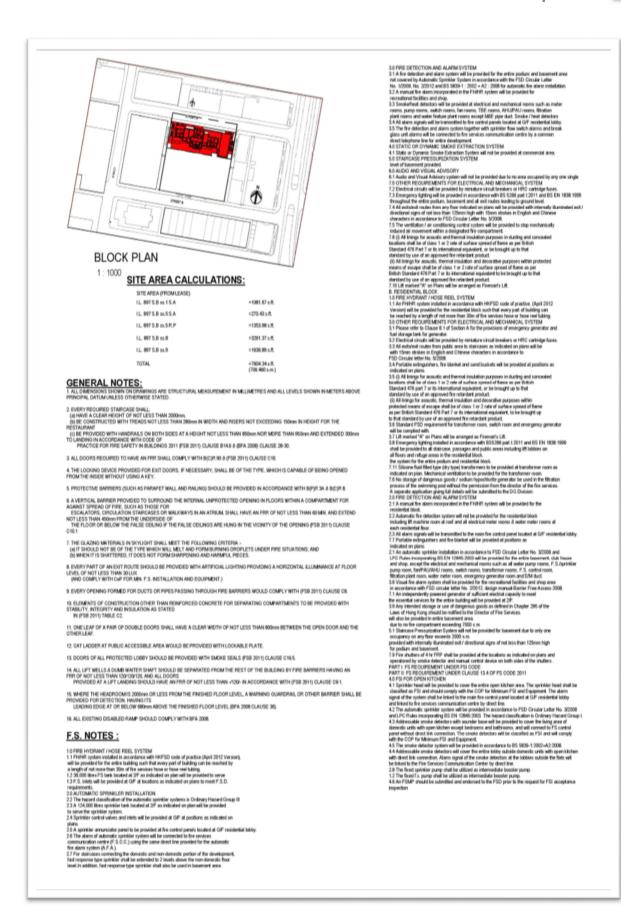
Site Location Plan and Notes produced by BIM approach
